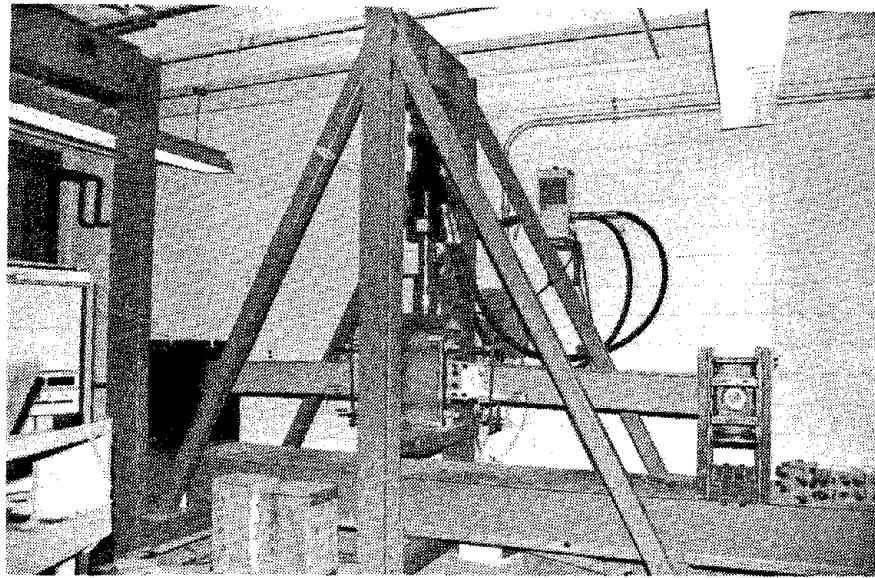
LOADING FRAME AND TEST SET-UP
